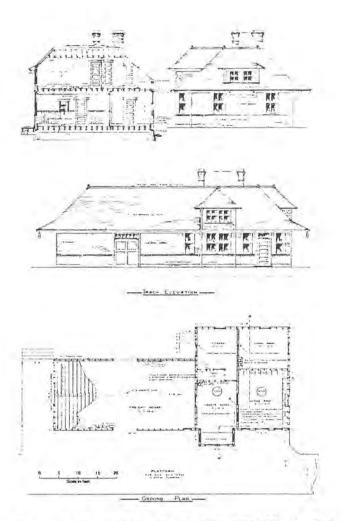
The Grand Trunk Pacific's Type D station plan 100-54.13
